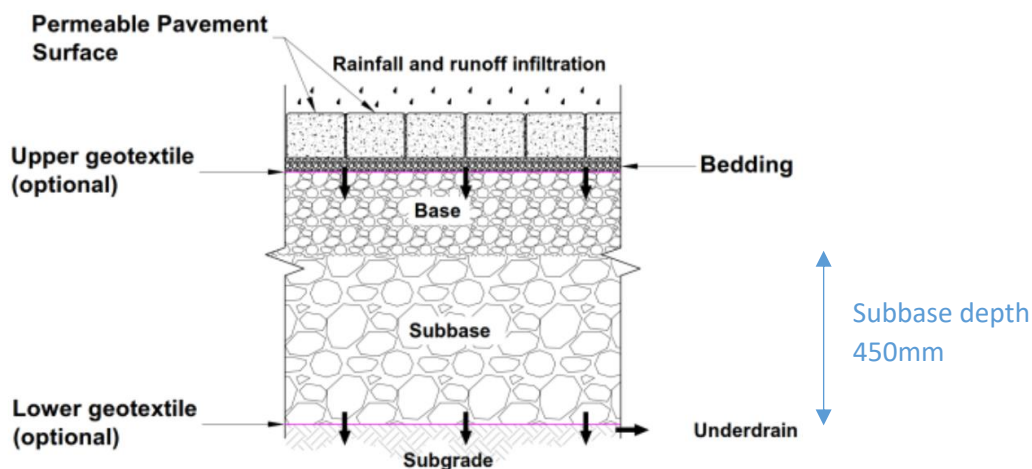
Typical permeable paving cross-section with stated subbase depth
